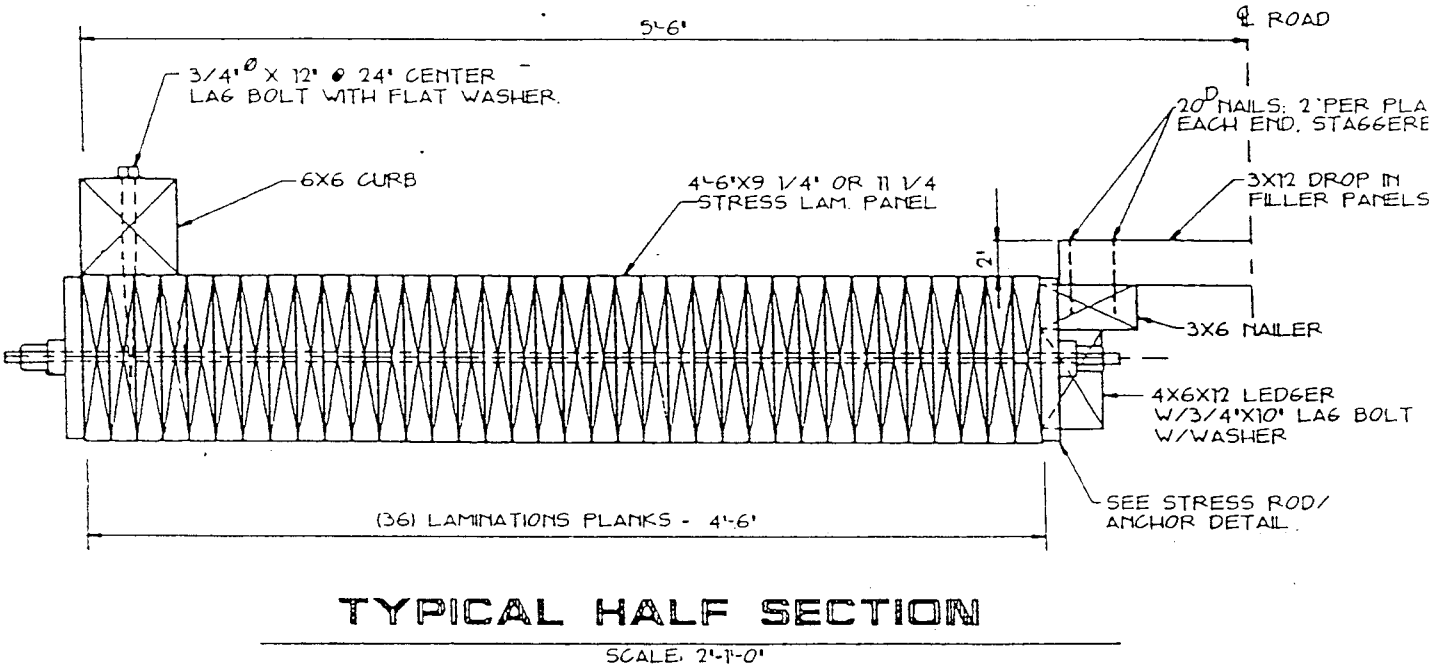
Section view of the longitudinal stress-laminated timber deck bridge.
